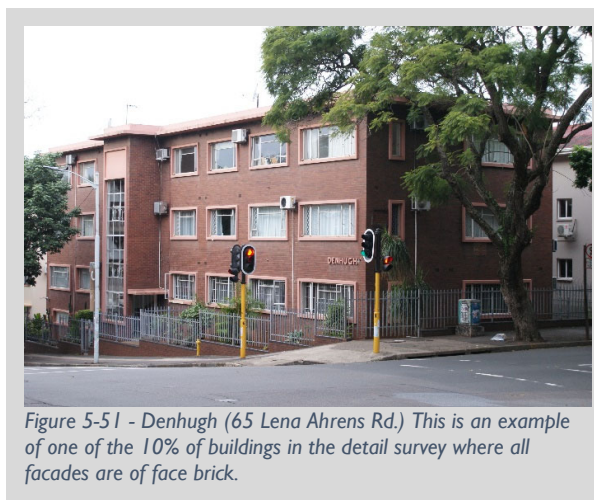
Denhugh (65 Lena Ahrens Rd.) This is an example of one of the 10% of buildings in the detail survey where all facades are of face brick.
